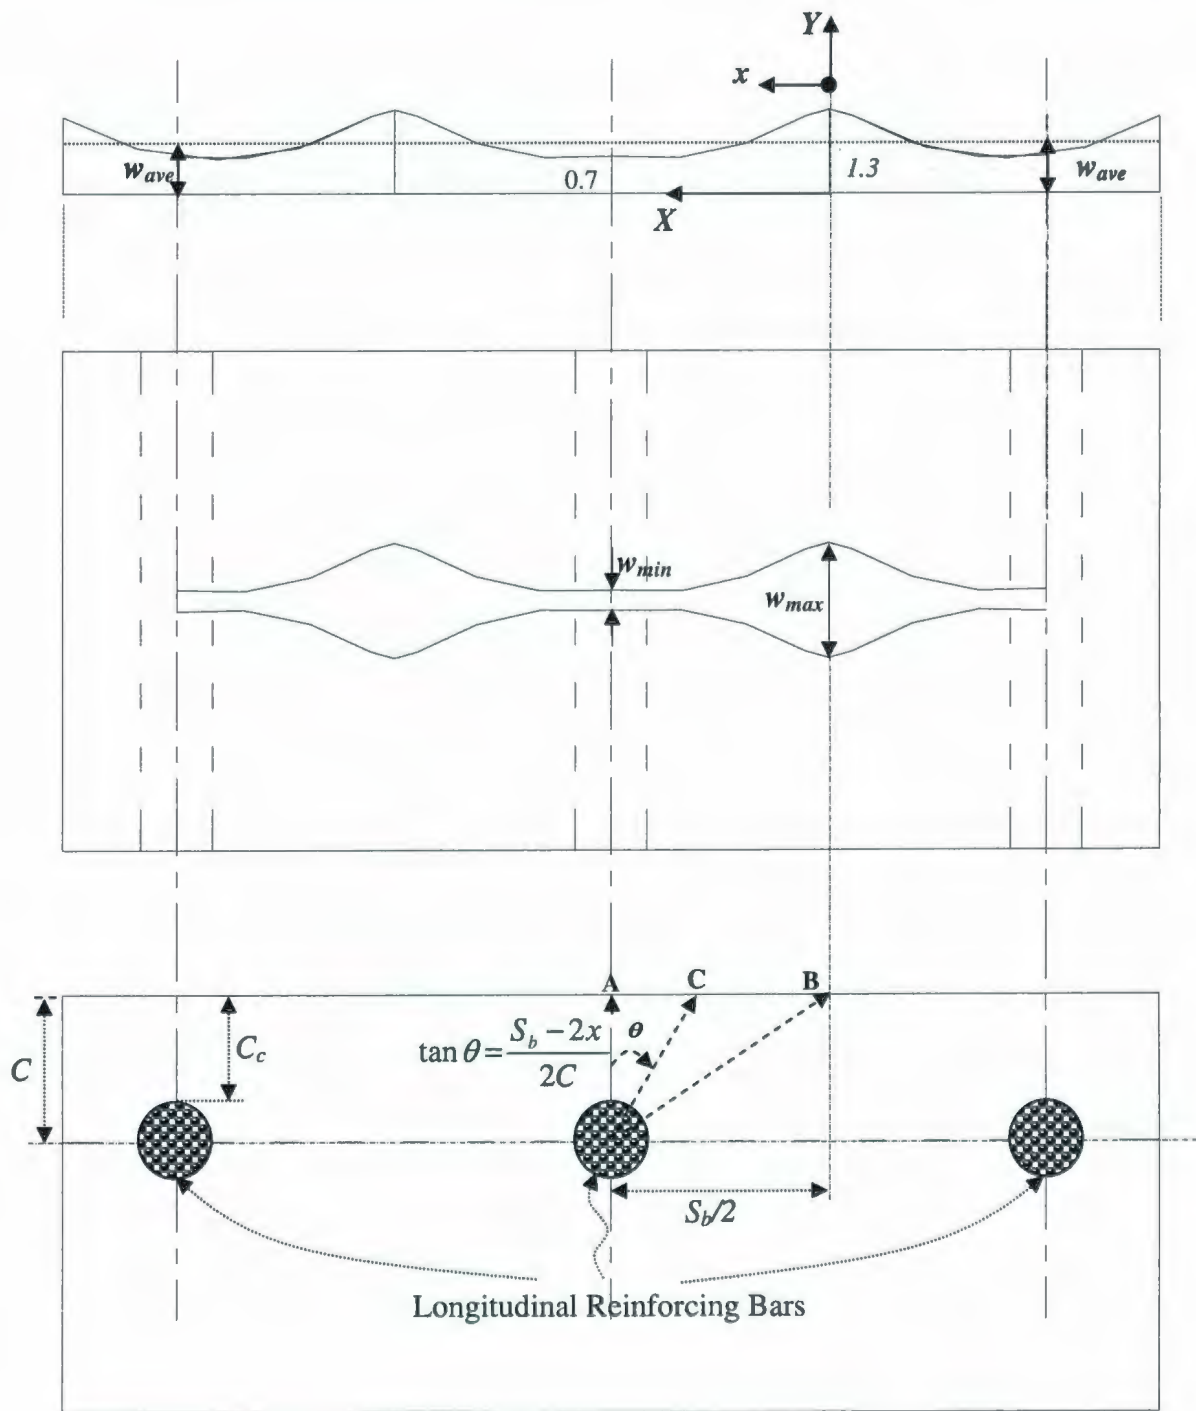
Crack Width Variation between Adjacent Reinforcing Bars
